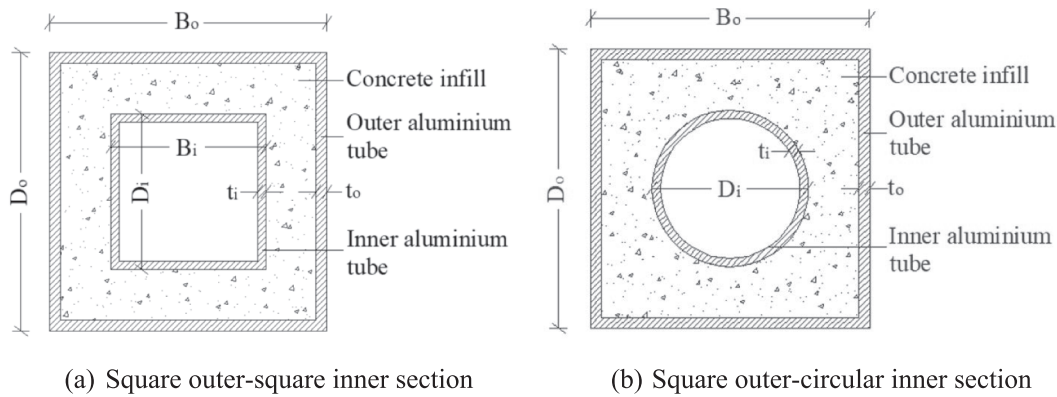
Cross-sectional geometry of typical CFDSAT specimens.
